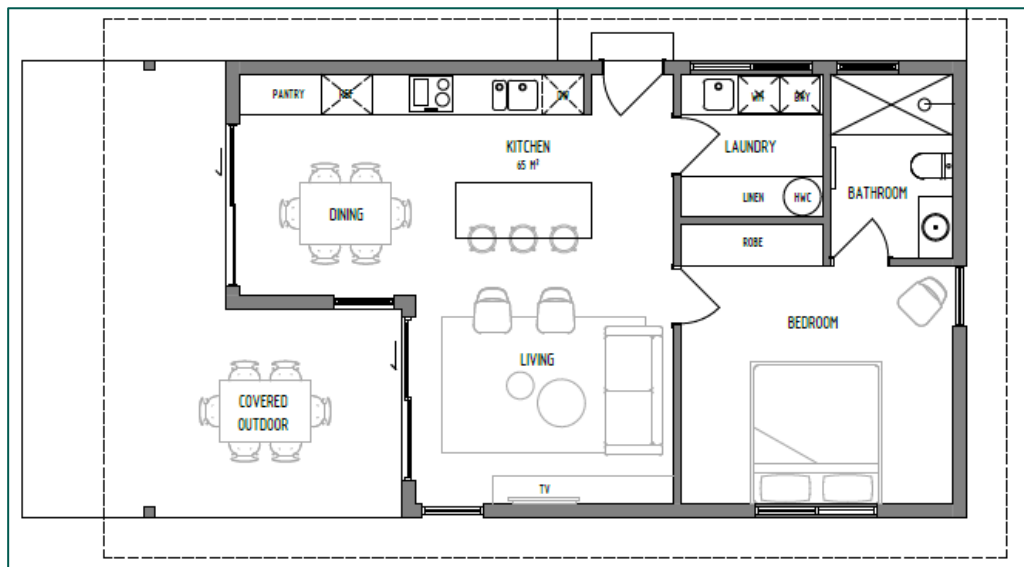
Kaumātua / Kuia – One-Bedroom Floor Plan. Source: ĀKAU.
